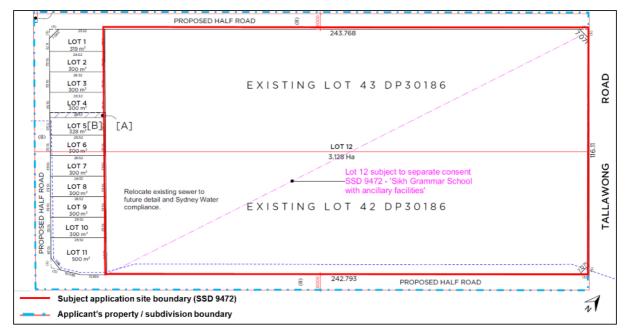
| Proposed subdivision plan, part of a separate development application submitted to Council (DA-19-01597) (Base source: Applicant's SRtS 2020)
